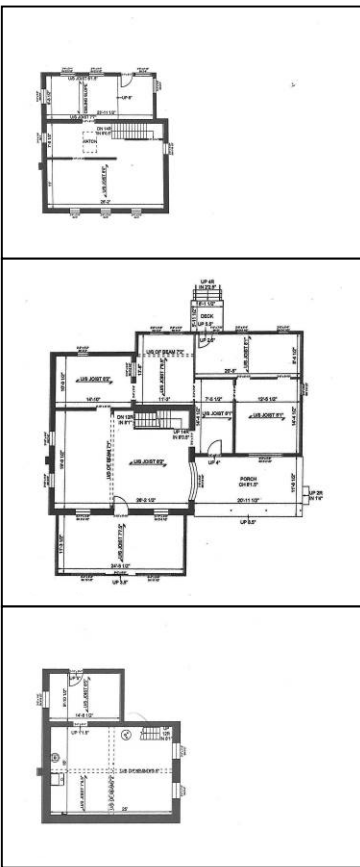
Floor Plans existing house. Top to bottom: 2nd Floor, Ground Floor, Basement.
